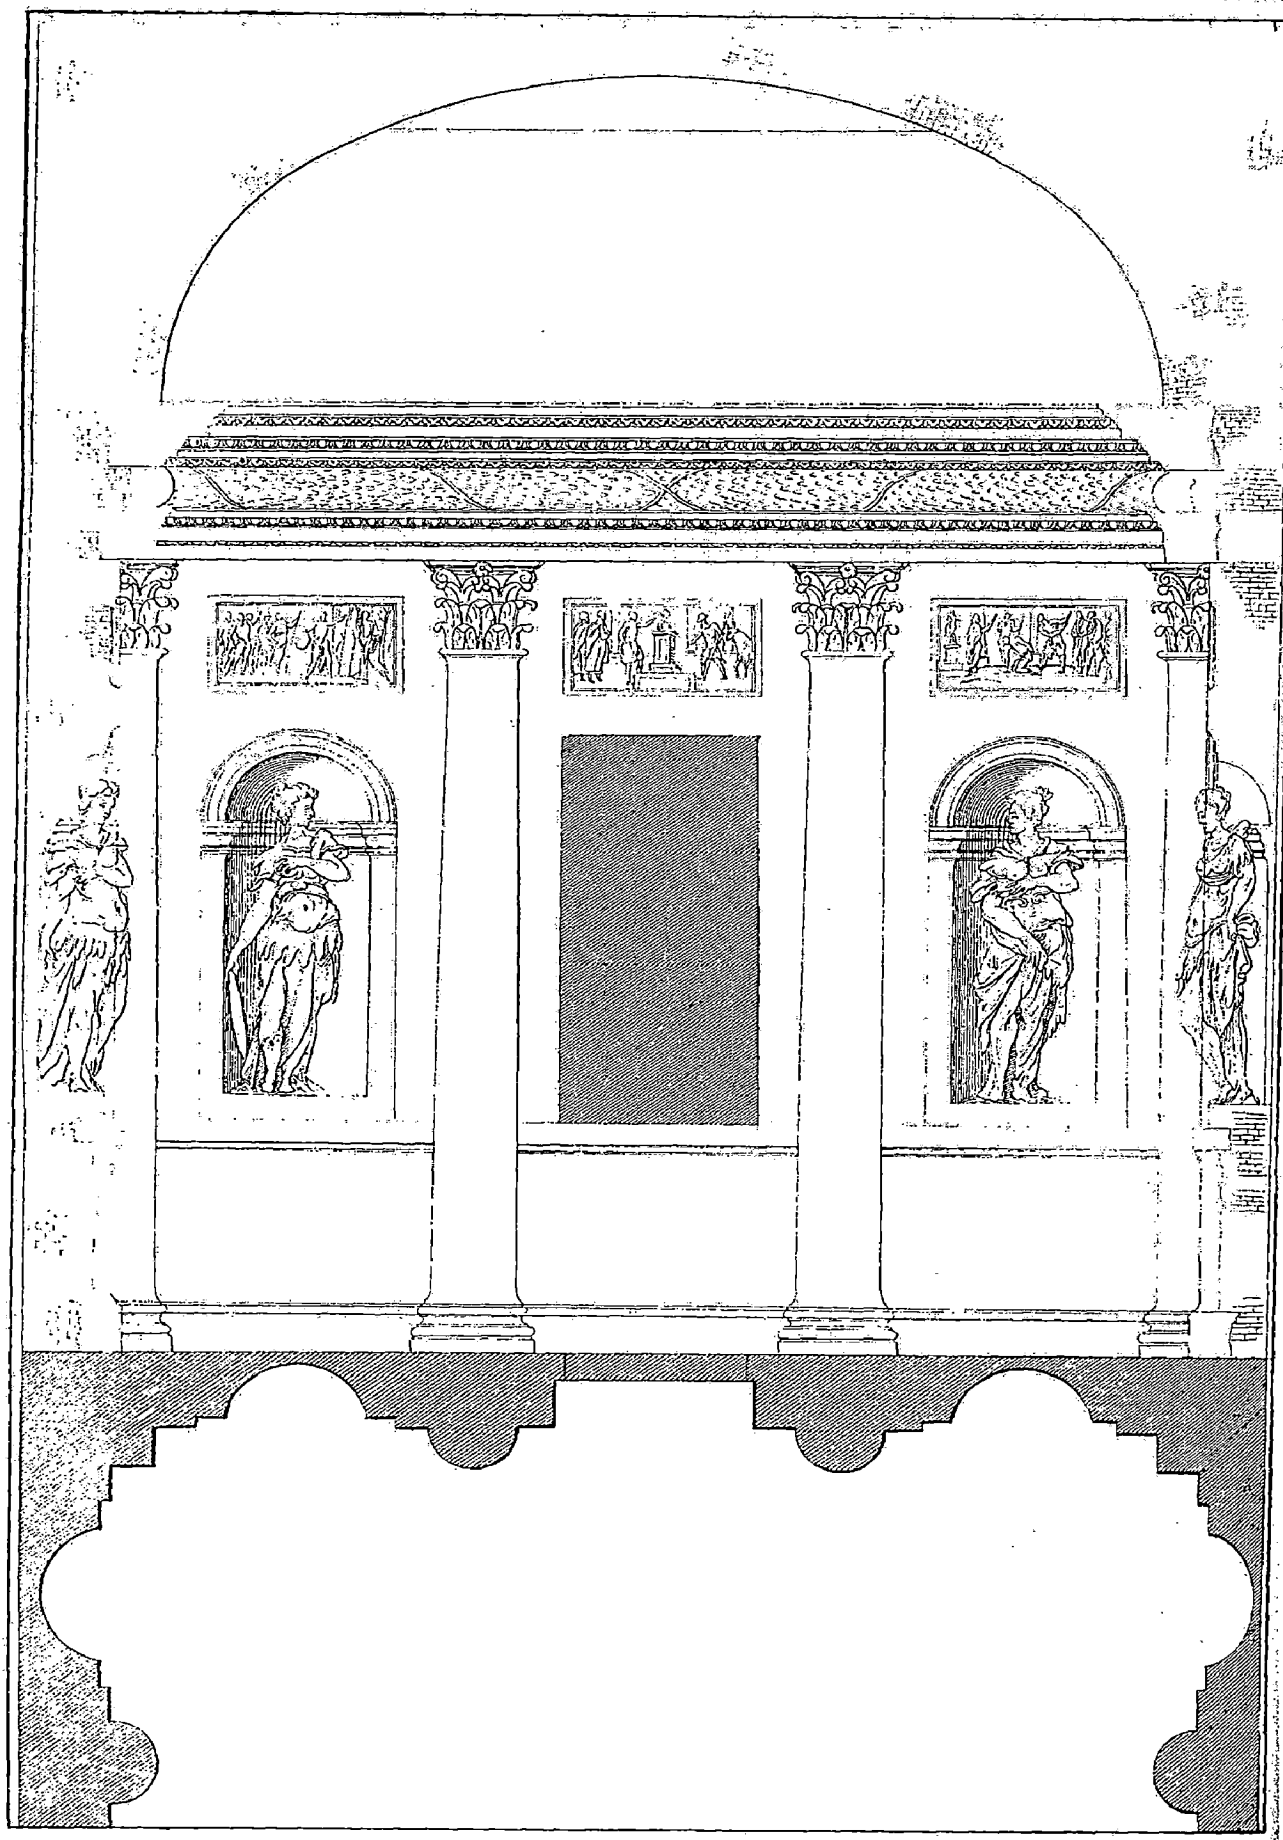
A Corinthian hall with half-columns in partial plan and sectional elevation
